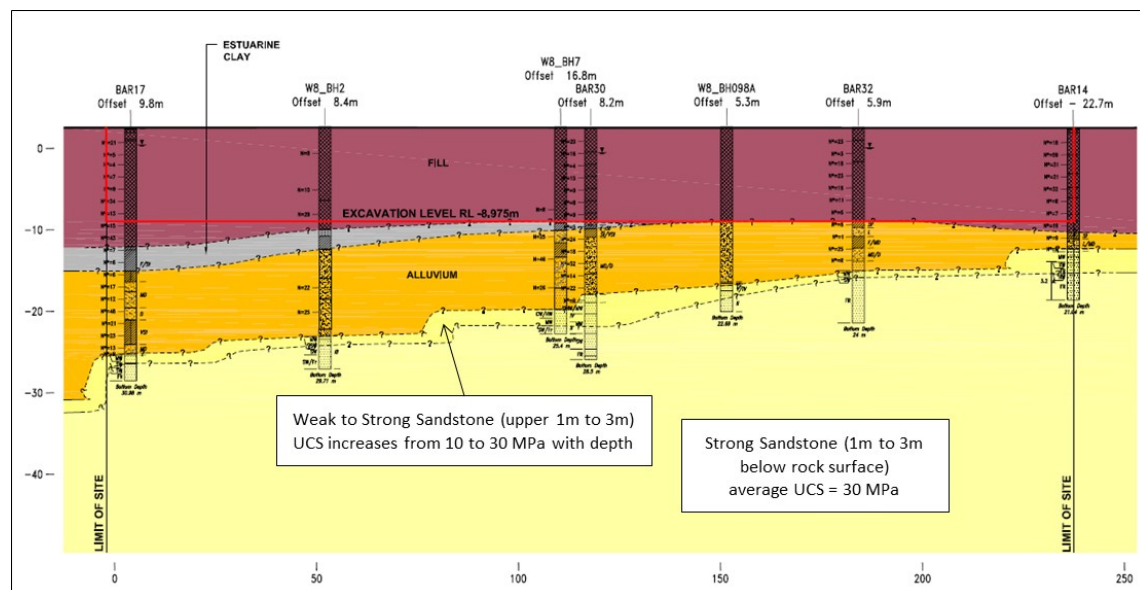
Typical Subsurface Profile at Barangaroo South Commercial Tower Site
